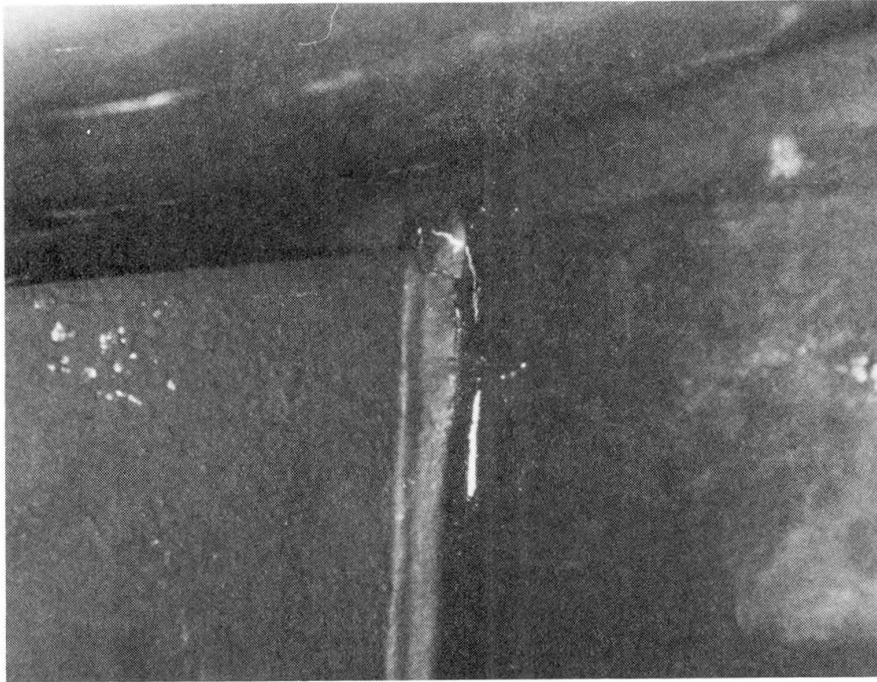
Typical Crack in Transverse Connection Plate-Web Weld
